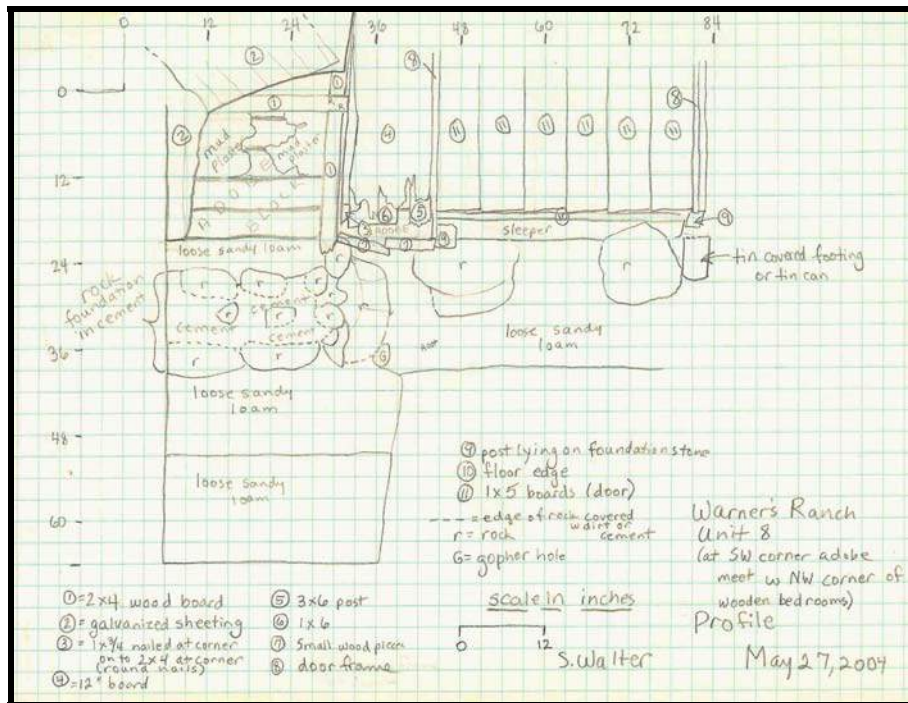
East sidewall profile of Unit 04-8. The cobble and lime facing is labeled "rock foundation in cement."
